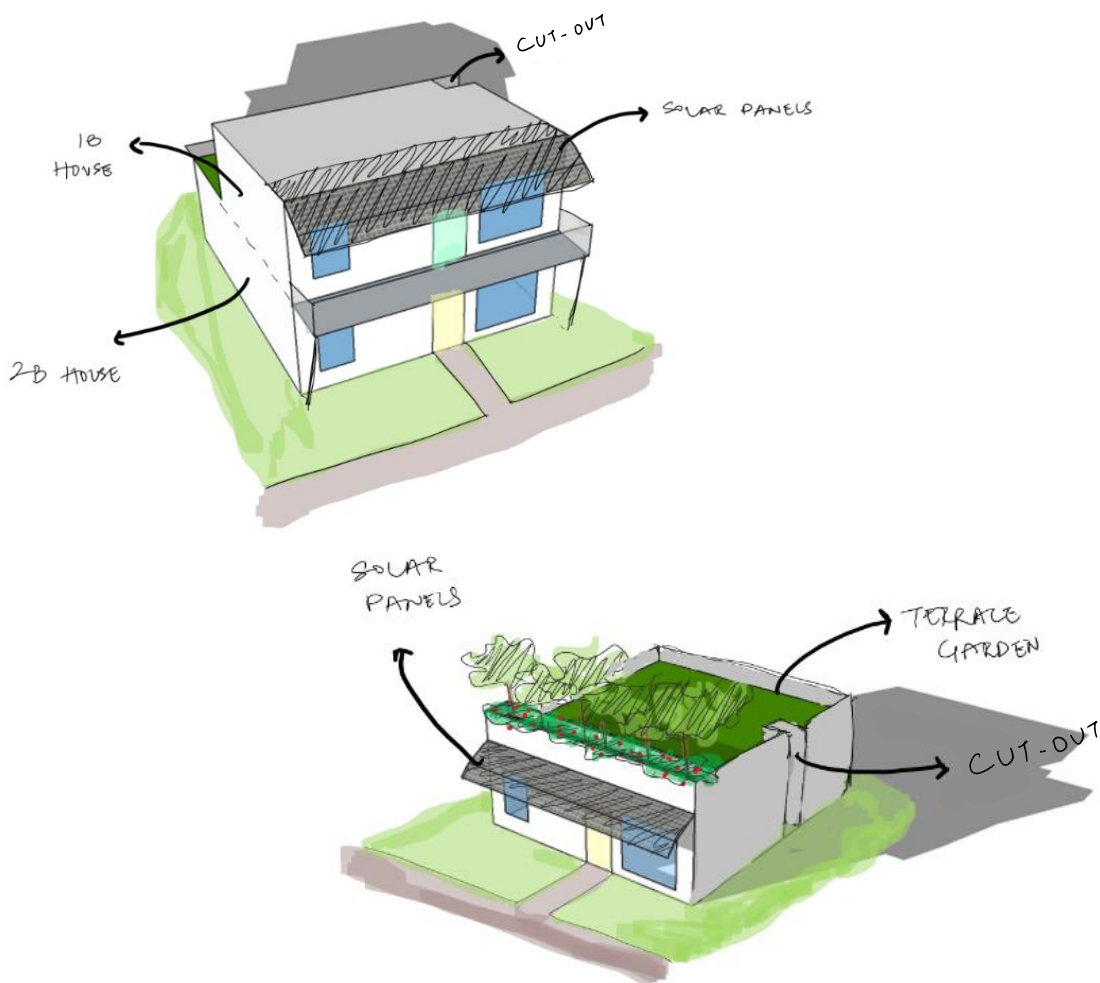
South west view of one + two-bedroom house (top), south east view two-bedroom house (bottom)
